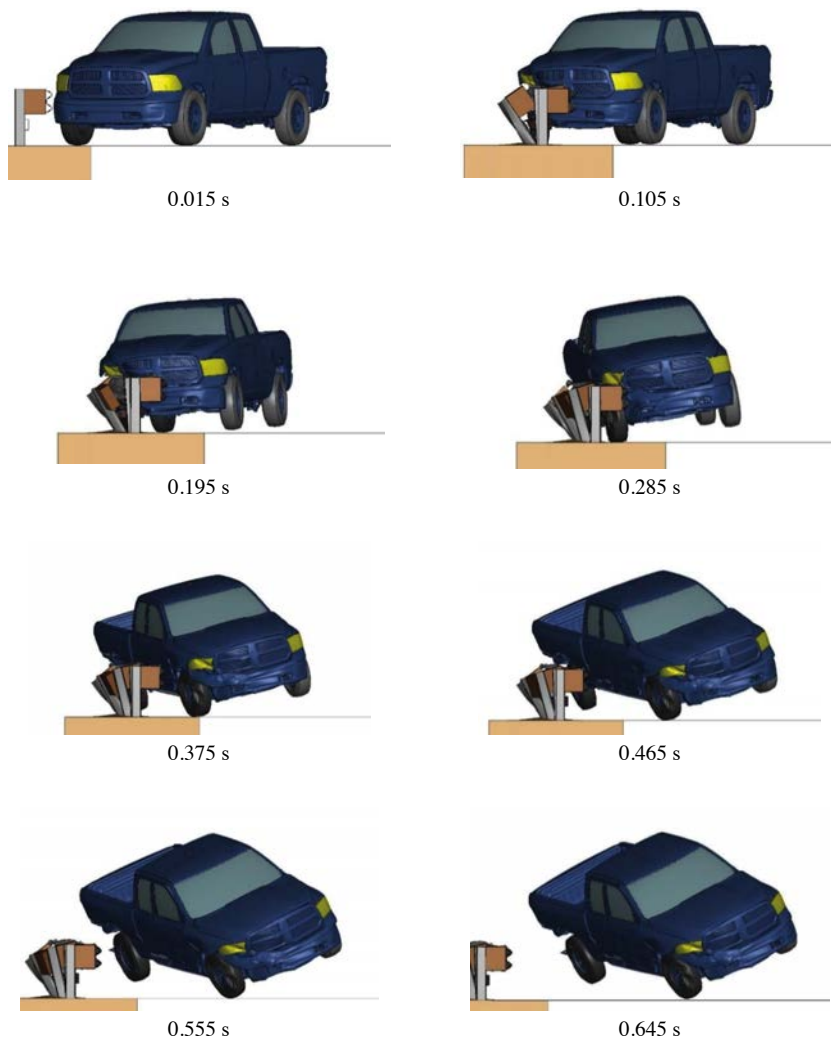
MGS with C6×8.2 rub rail mounted 12 inches above grade – downstream view of MASH Test 3-11.
